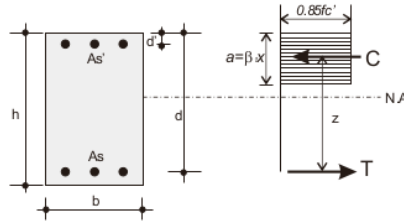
Stress Block Model of the ultimate capacity of the Steel Reinforced Concrete beams
